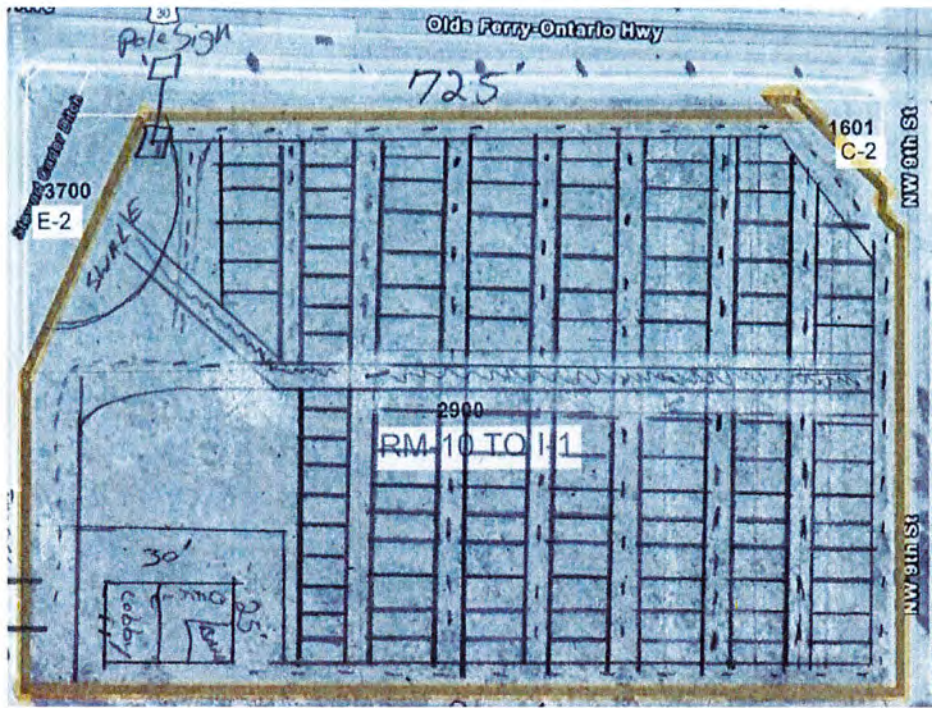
Rough Site Plan for Proposed Indoor Storage Units
